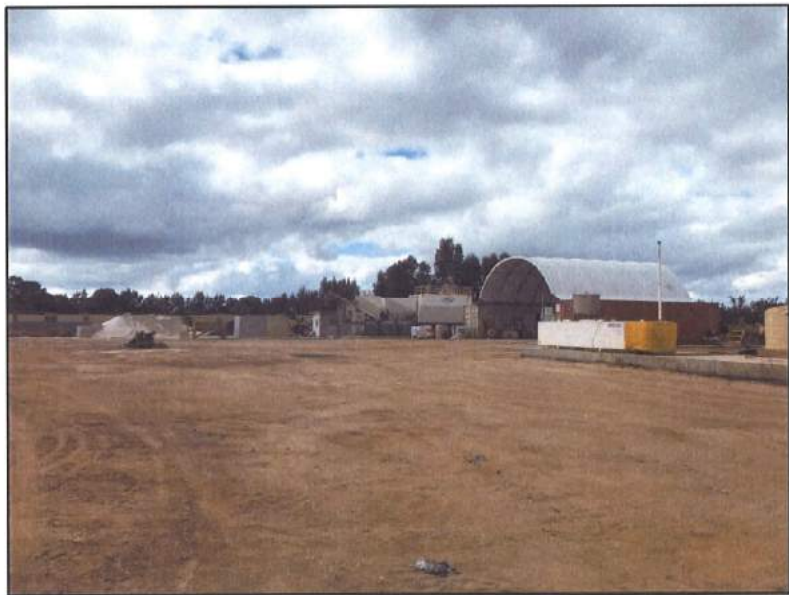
View of existing concrete batching plant to the south-east of the subject land
